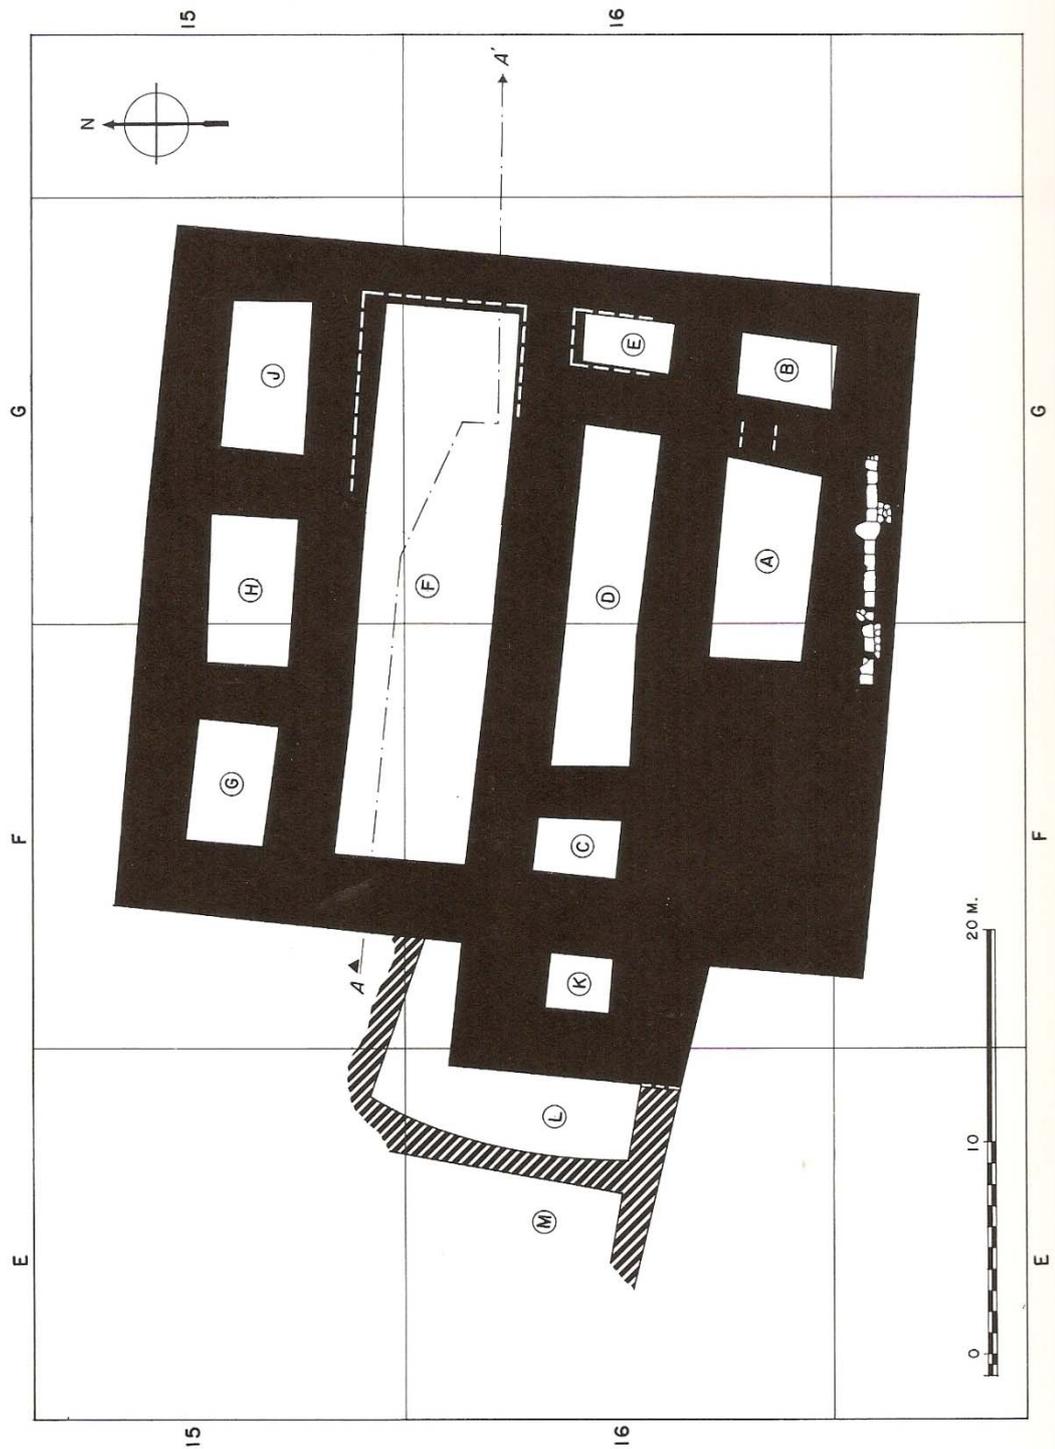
Plan of Building XII at Tell Ta'yinat (First BP)
